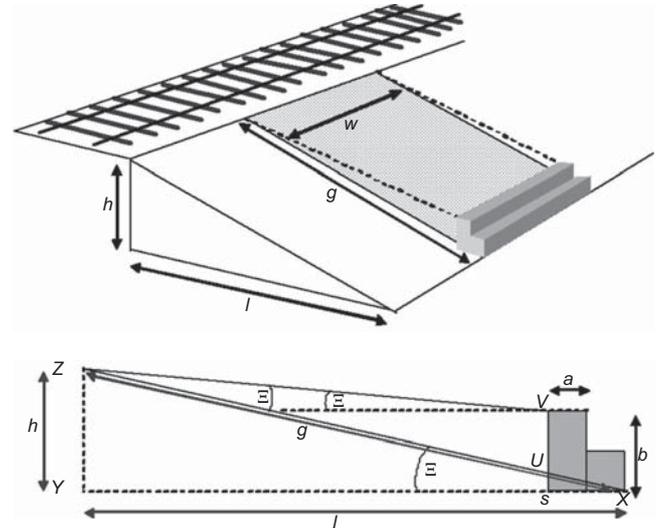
Geometry of the gabion and slope slackening repair at South Greenford
